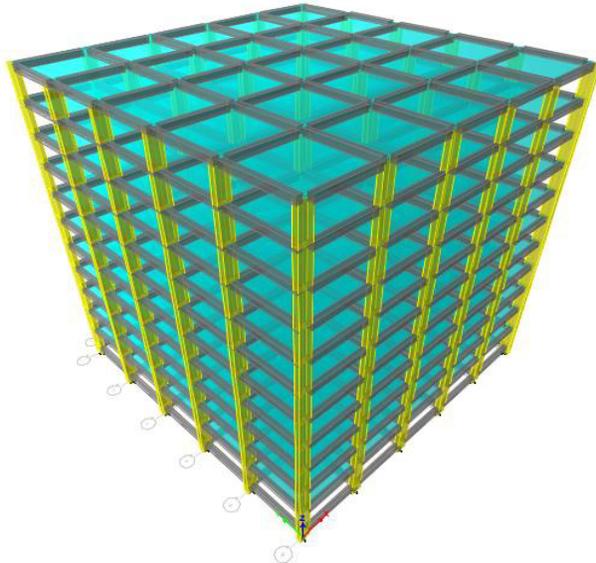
SHOWS 3D MODEL OF RC BUILDING ON PLAIN GROUND
